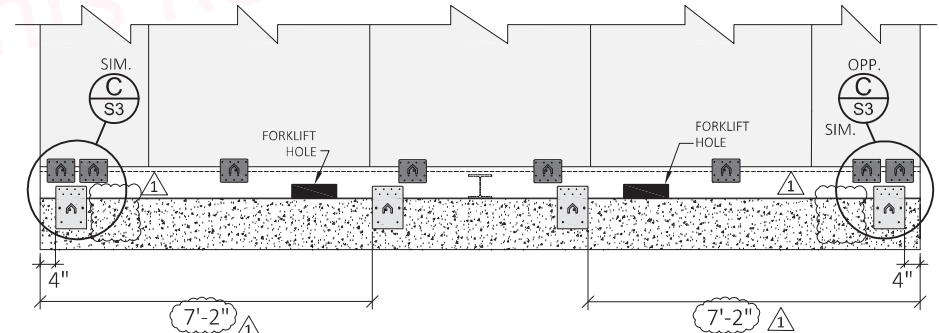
PLATE LAYOUT IF ROOF TRUSSES ARE USED
